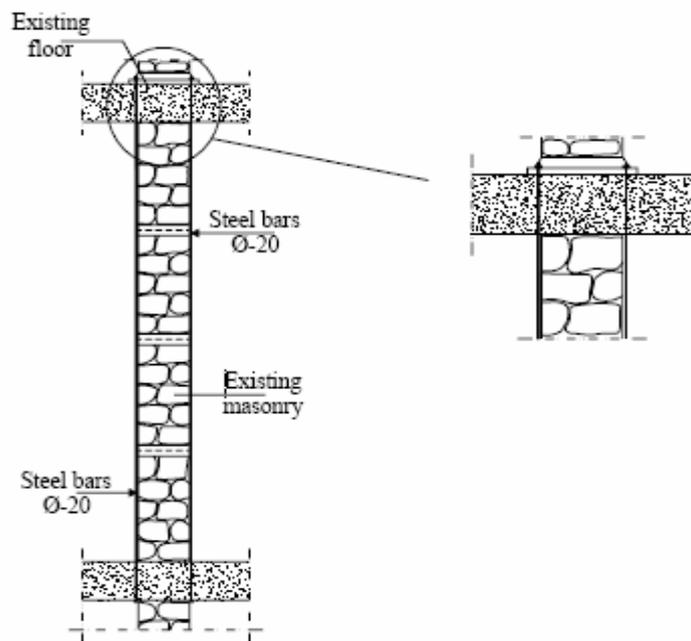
steel bars precompression in a wall (EU-India cross program, 2006)
